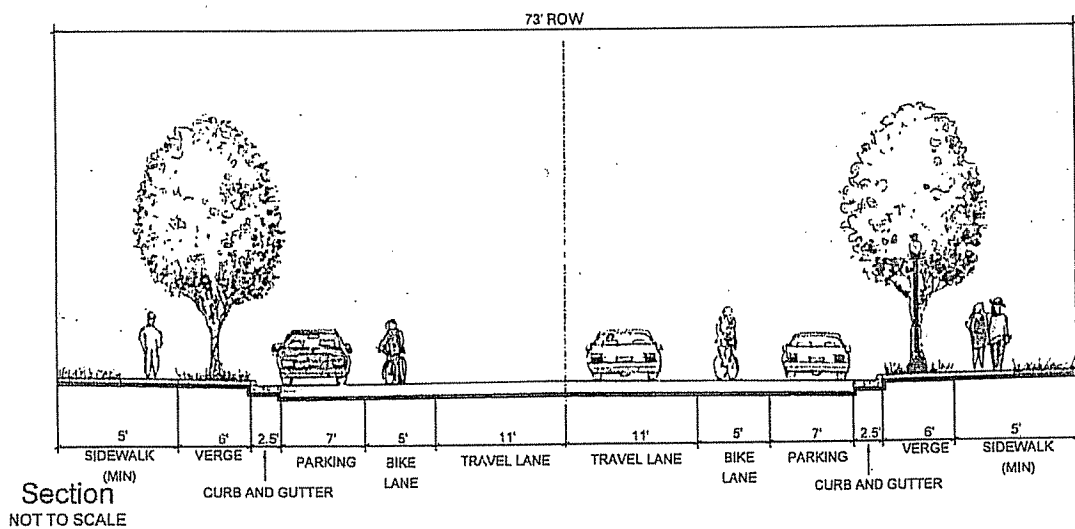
Striped Bike Lanes and Parking Cross-Section
